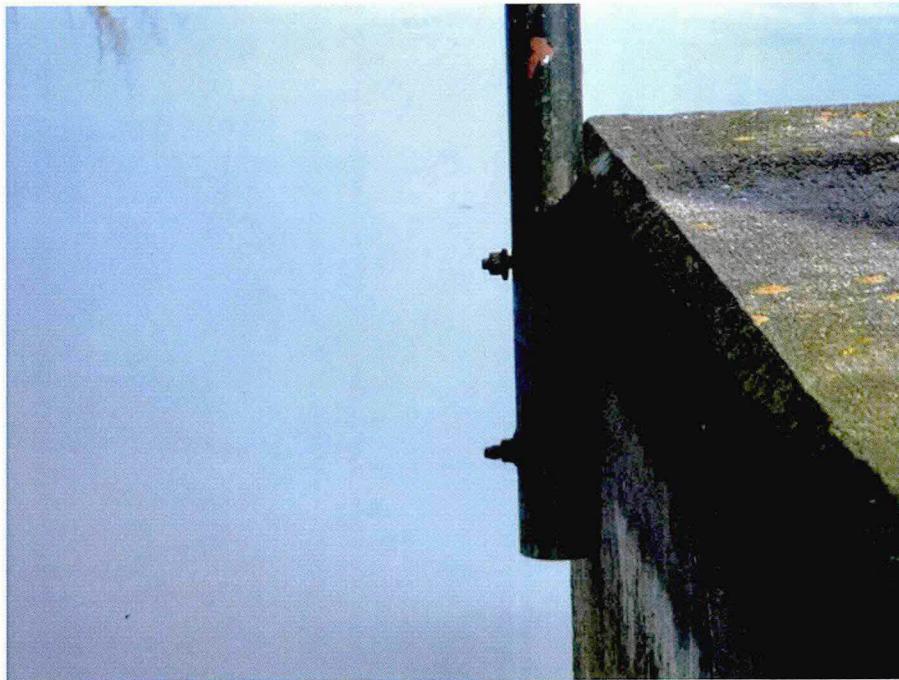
Northeast Wall Northern End– End Rail Post Connection
